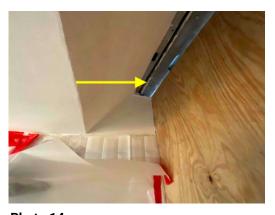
Unit No. 200 - View of existing metal framing at head of window after existing window was removed - Work in progress.
